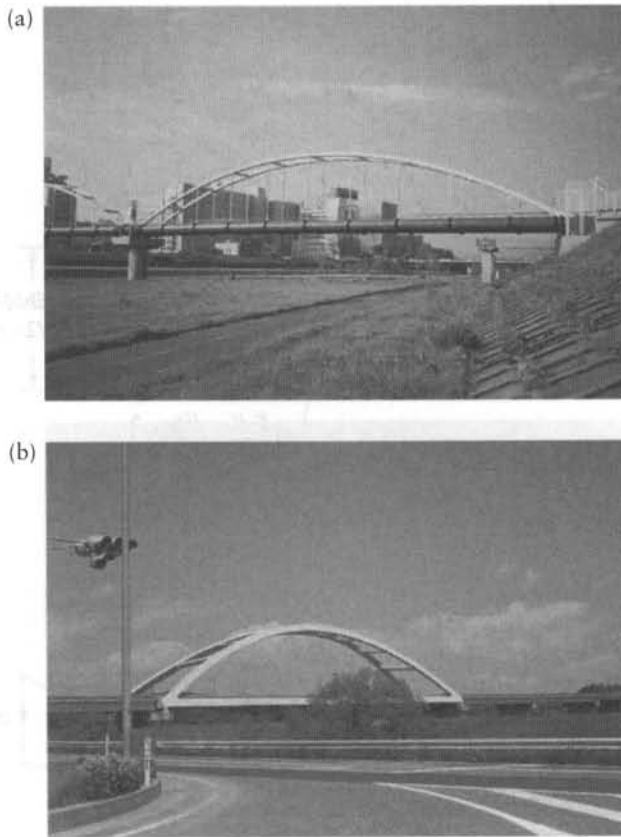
Arches with ties. (a) Bridge carrying a steel pipe. (b) Bridge carrying traffic load.
